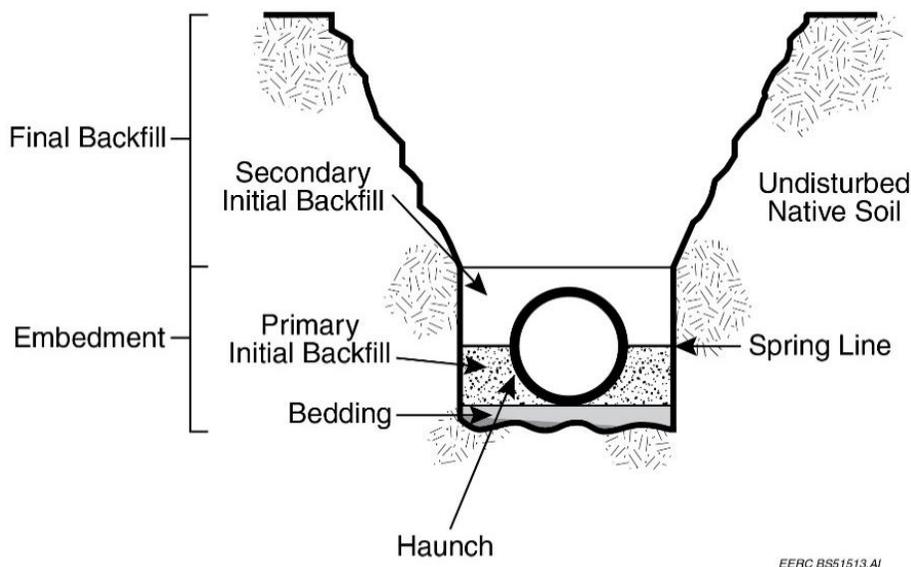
Cross section of pipeline trench and backfill labels (Plastics Pipe Institute, 2009).
